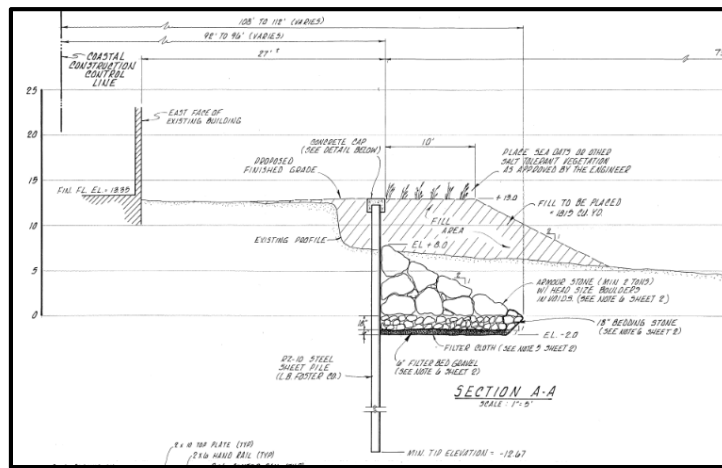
Typical Cross-Section: Cantilever Seawall with rock toe-revetment
